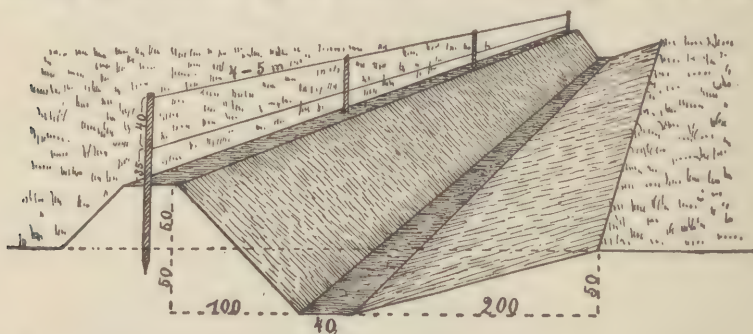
Enclosure with lower fence, flat ditch and embankment (single ditch).
